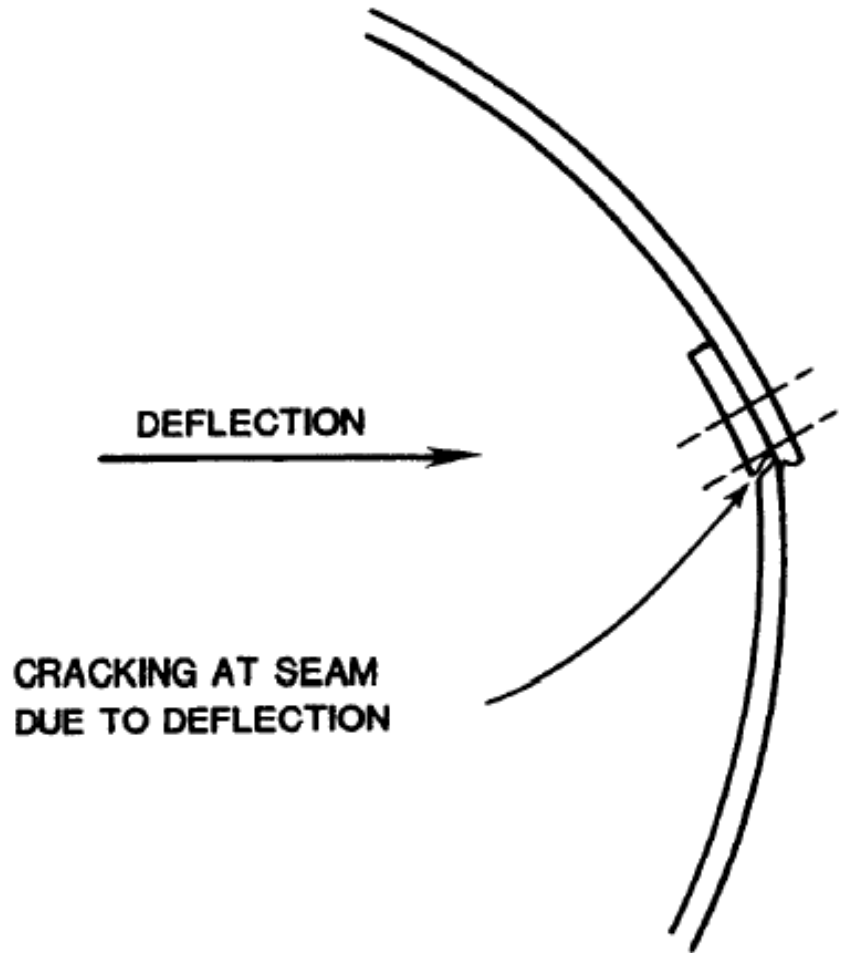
(Exhibit 71) Cracking Due to Deflection
